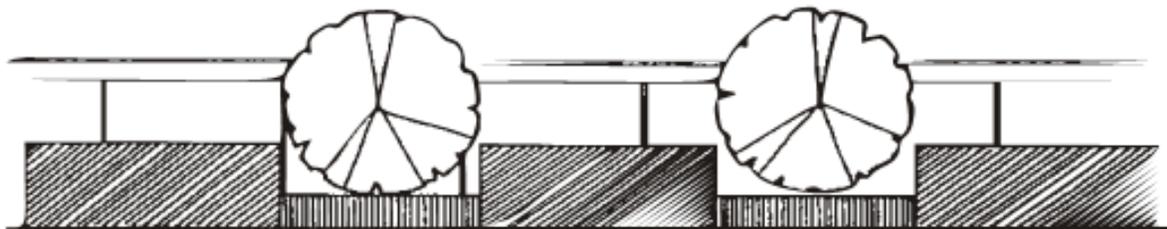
Existing Tree Crown - Proposed Awning Conflict Plan
